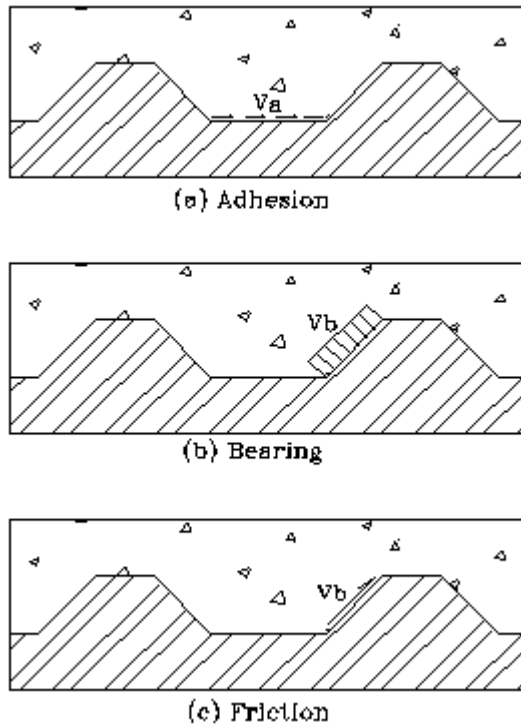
Bond mechanisms for the deformed steel rebar and the concrete
